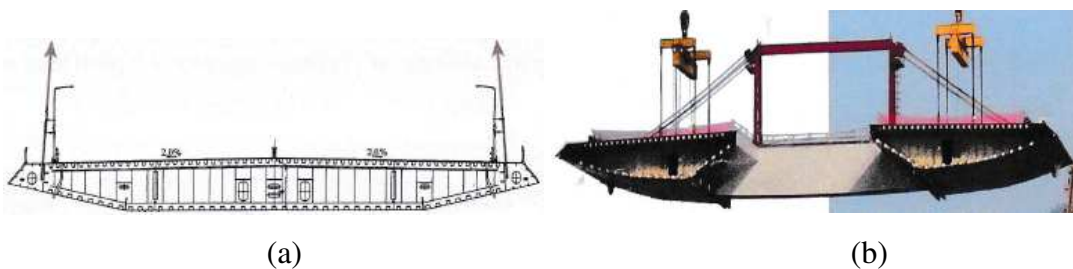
9: Steel cross-section: box girder (You *et al.*, 2008 apud Svensson, 2012); two box girders (Morgenthal, 2008 apud Svensson, 2012).
